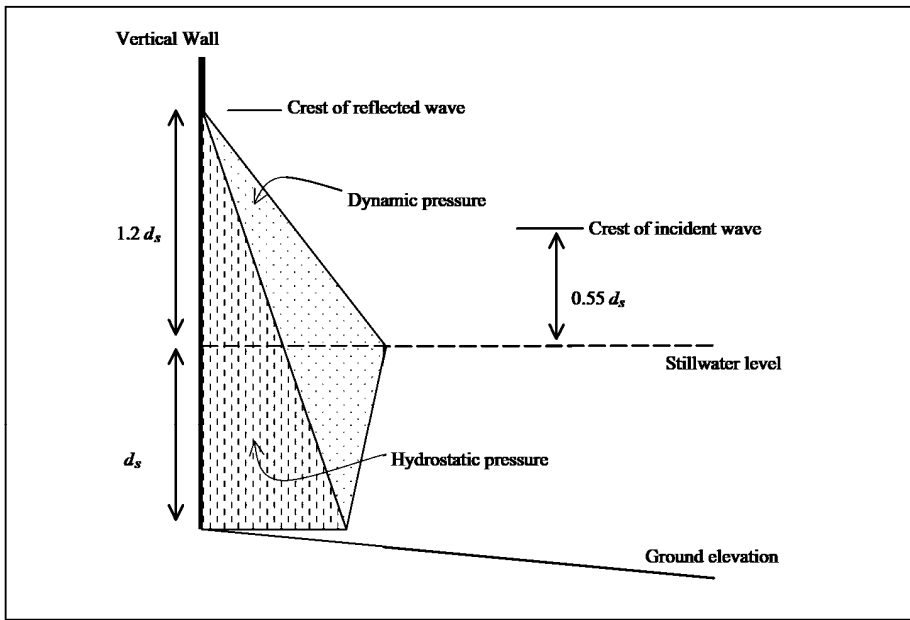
Normally Incident Breaking Wave Pressures against a Vertical Wall (Space behind Vertical Wall is Dry).
